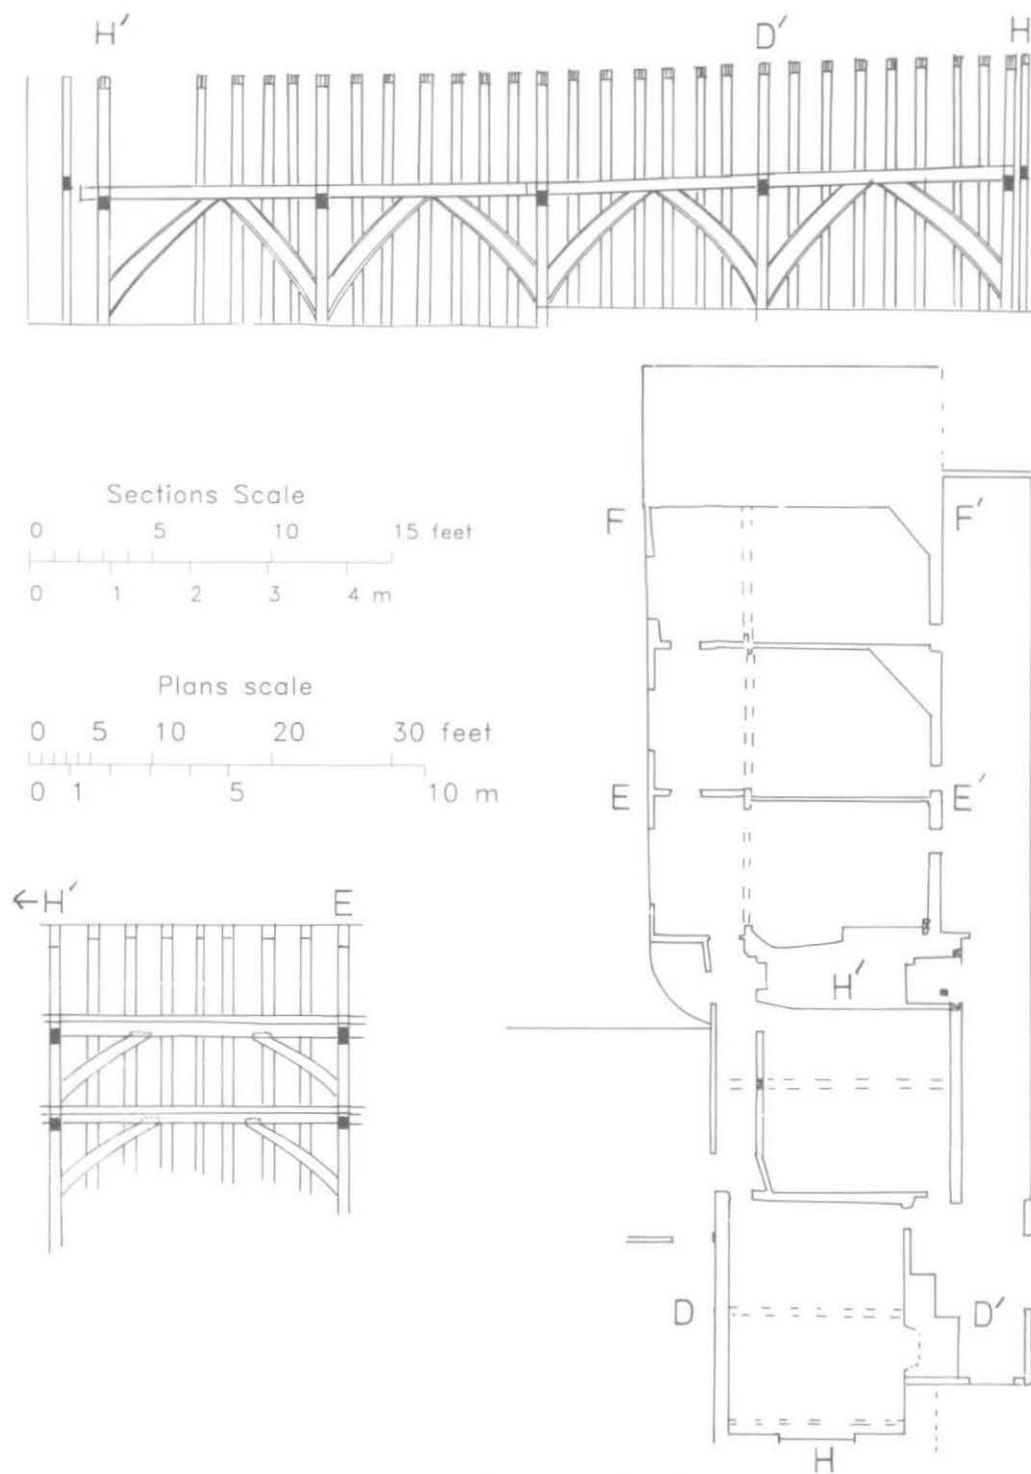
Manor House, Sutton: first floor plan of north-east wing; sections.
